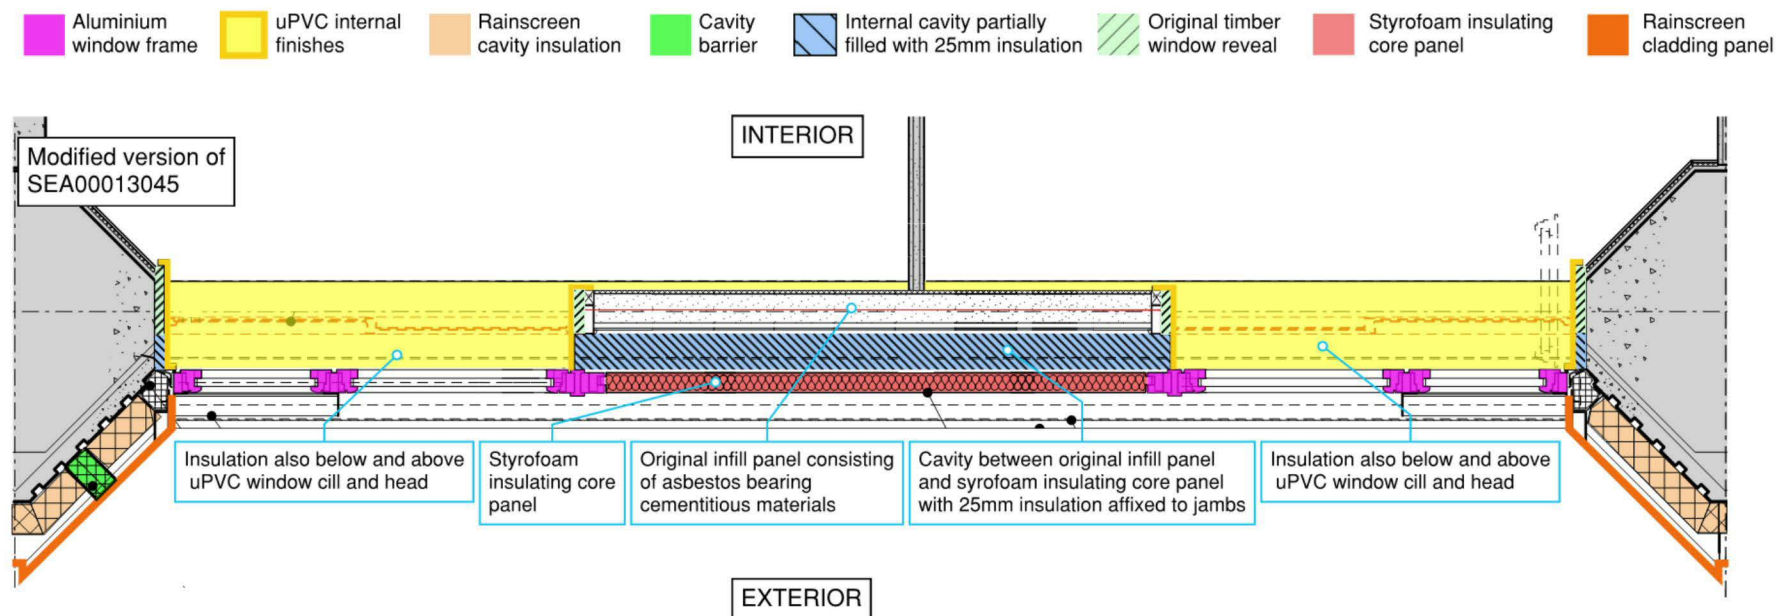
Locations of elements of construction relating to the external wall – Plan view [annotated and modified SEA00013045]
